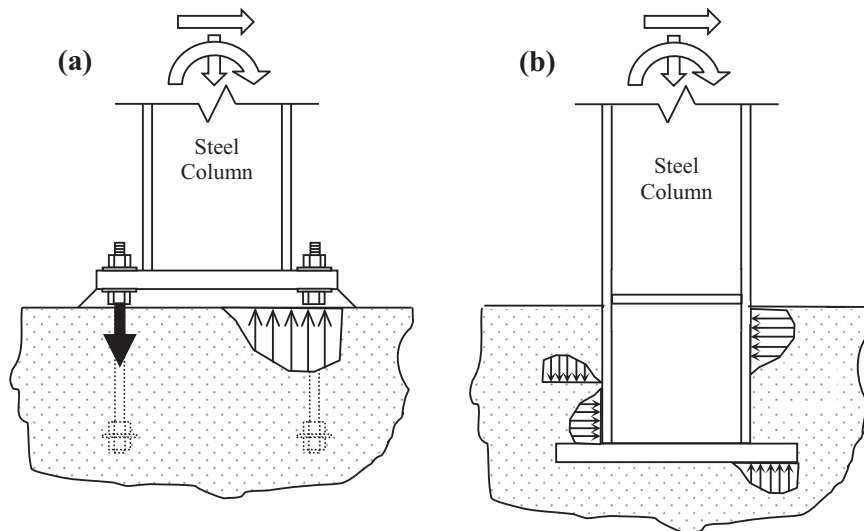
Types of column base connections: (a) exposed base plate connection with forces resisted by vertical bearing and anchor rod tension, (b) embedded column base, with forces resisted by horizontal bearing stress on column flanges, and vertical bearing stresses on embedded plate.
